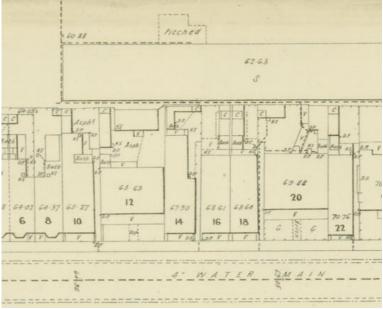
Extract MMBW Detail Plan No.1358 showing the houses in 1898
